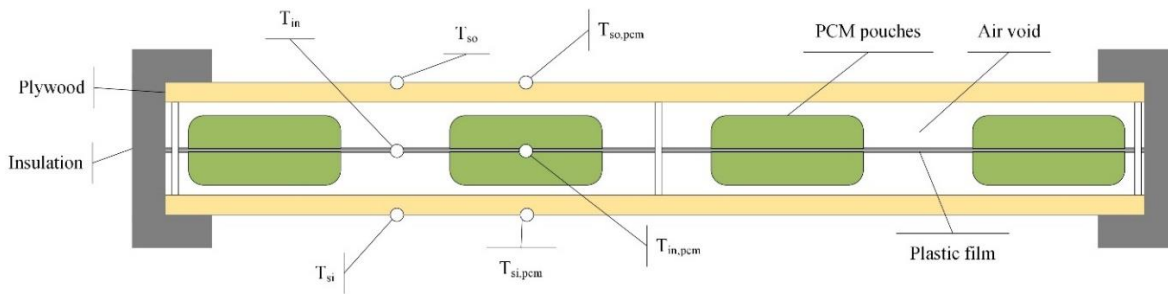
Schematic of the instrumented PCM-equipped walls
